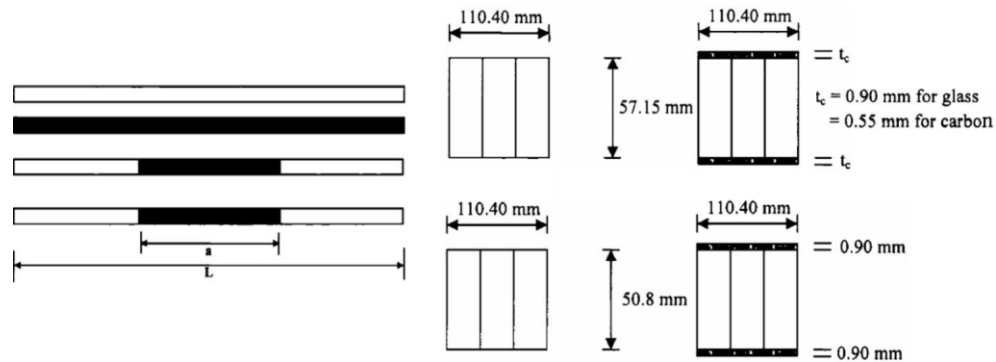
Strengthening schemes along the length of the column (unstrengthened, fully- strengthened, and partially-strengthened, i.e. length of the FRP laminates equal to a third of the column length and applied at the mid height) and in the cross section (unstrengthened and strengthened in the tension and compression faces) (Taheri et al. 2009).
